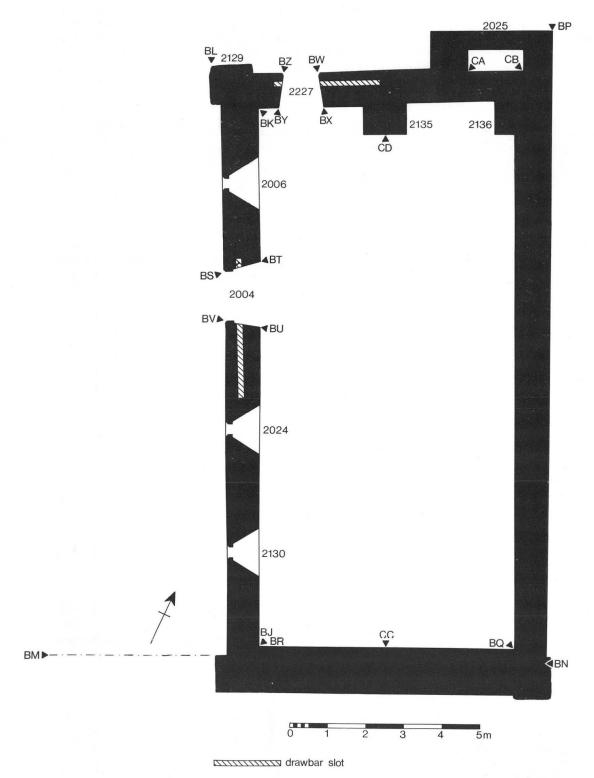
Phase II2 (centre). Building 2100. Block plan. Scale 1:100.
